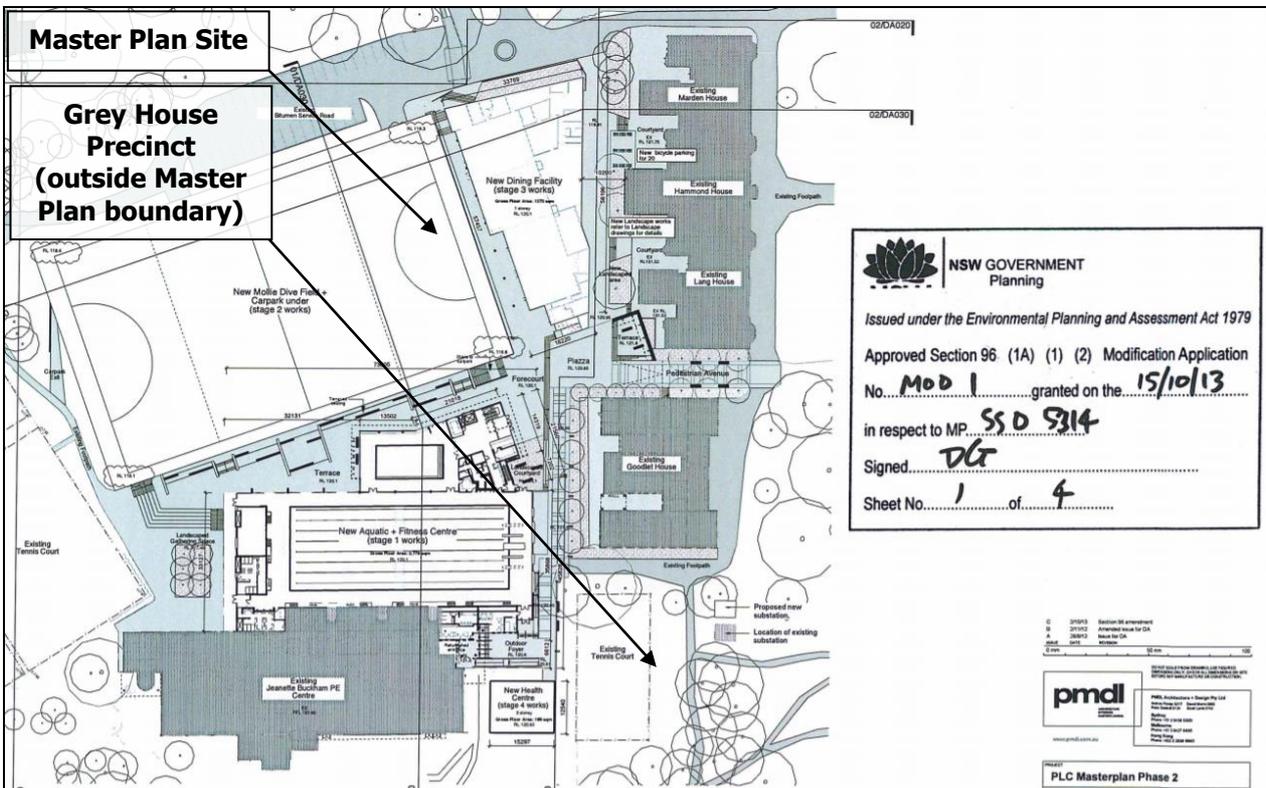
SSD 5314 MOD 1 Stamped Site Plan (PMDL 2012)
